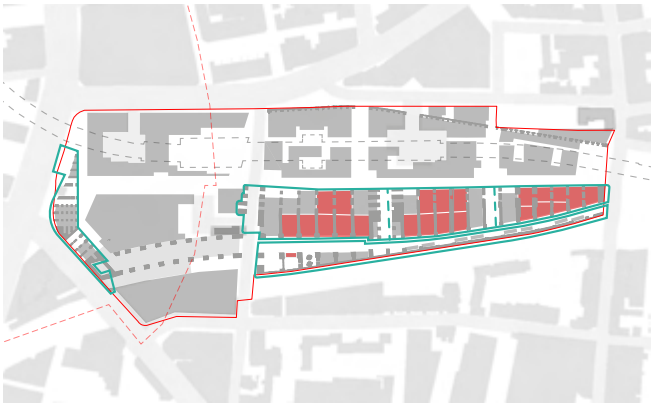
Key Plan: Locations of A1 units in Plot 7
